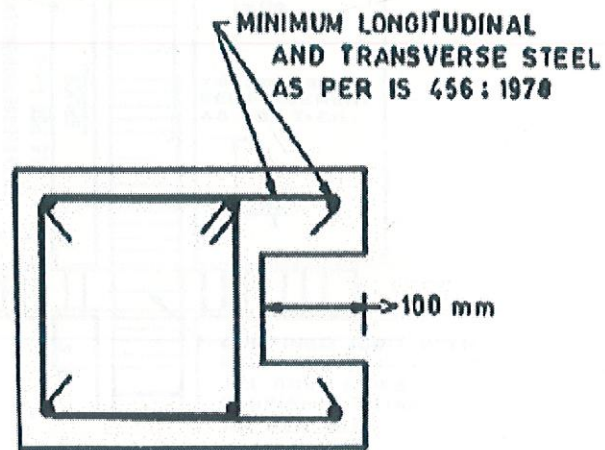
Reinforcement requirement for column with more than 100mm projection beyond core.
